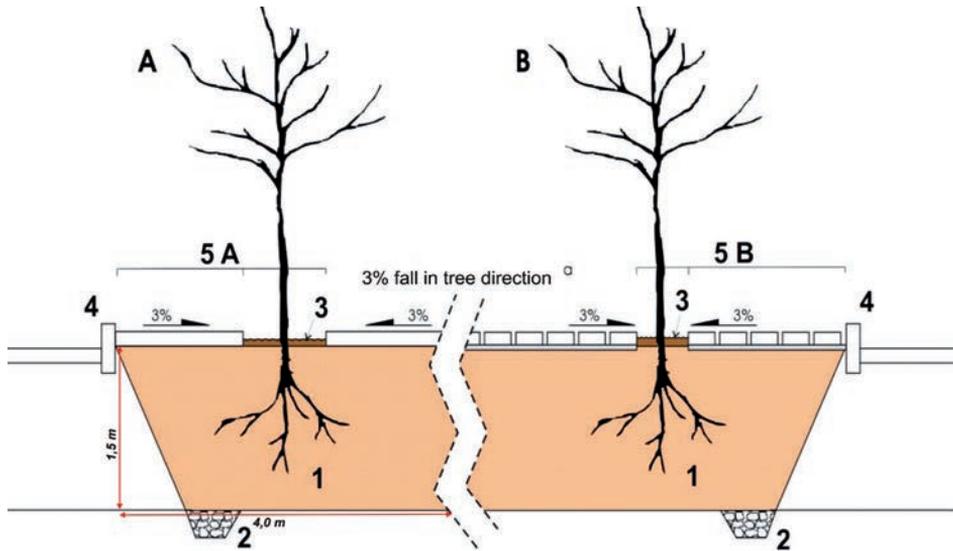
Technogenic structural soil used for construction of pavements with impermeable (A) and permeable (B) surface, e. g. brick pavers – after Borowski et al. (2005, modified). Explanations: 1 – structural soil to 60 cm; 2 – drainage; 3 – mulch; 4 – curb and road surface; 5A – impermeable pavement surface and appropriate size of a tree well – min. diameter 150 cm; 5B – permeable pavement surface, small elements separated by permeable joints on the permeable base, a smaller tree well, diameter – 100 cm
